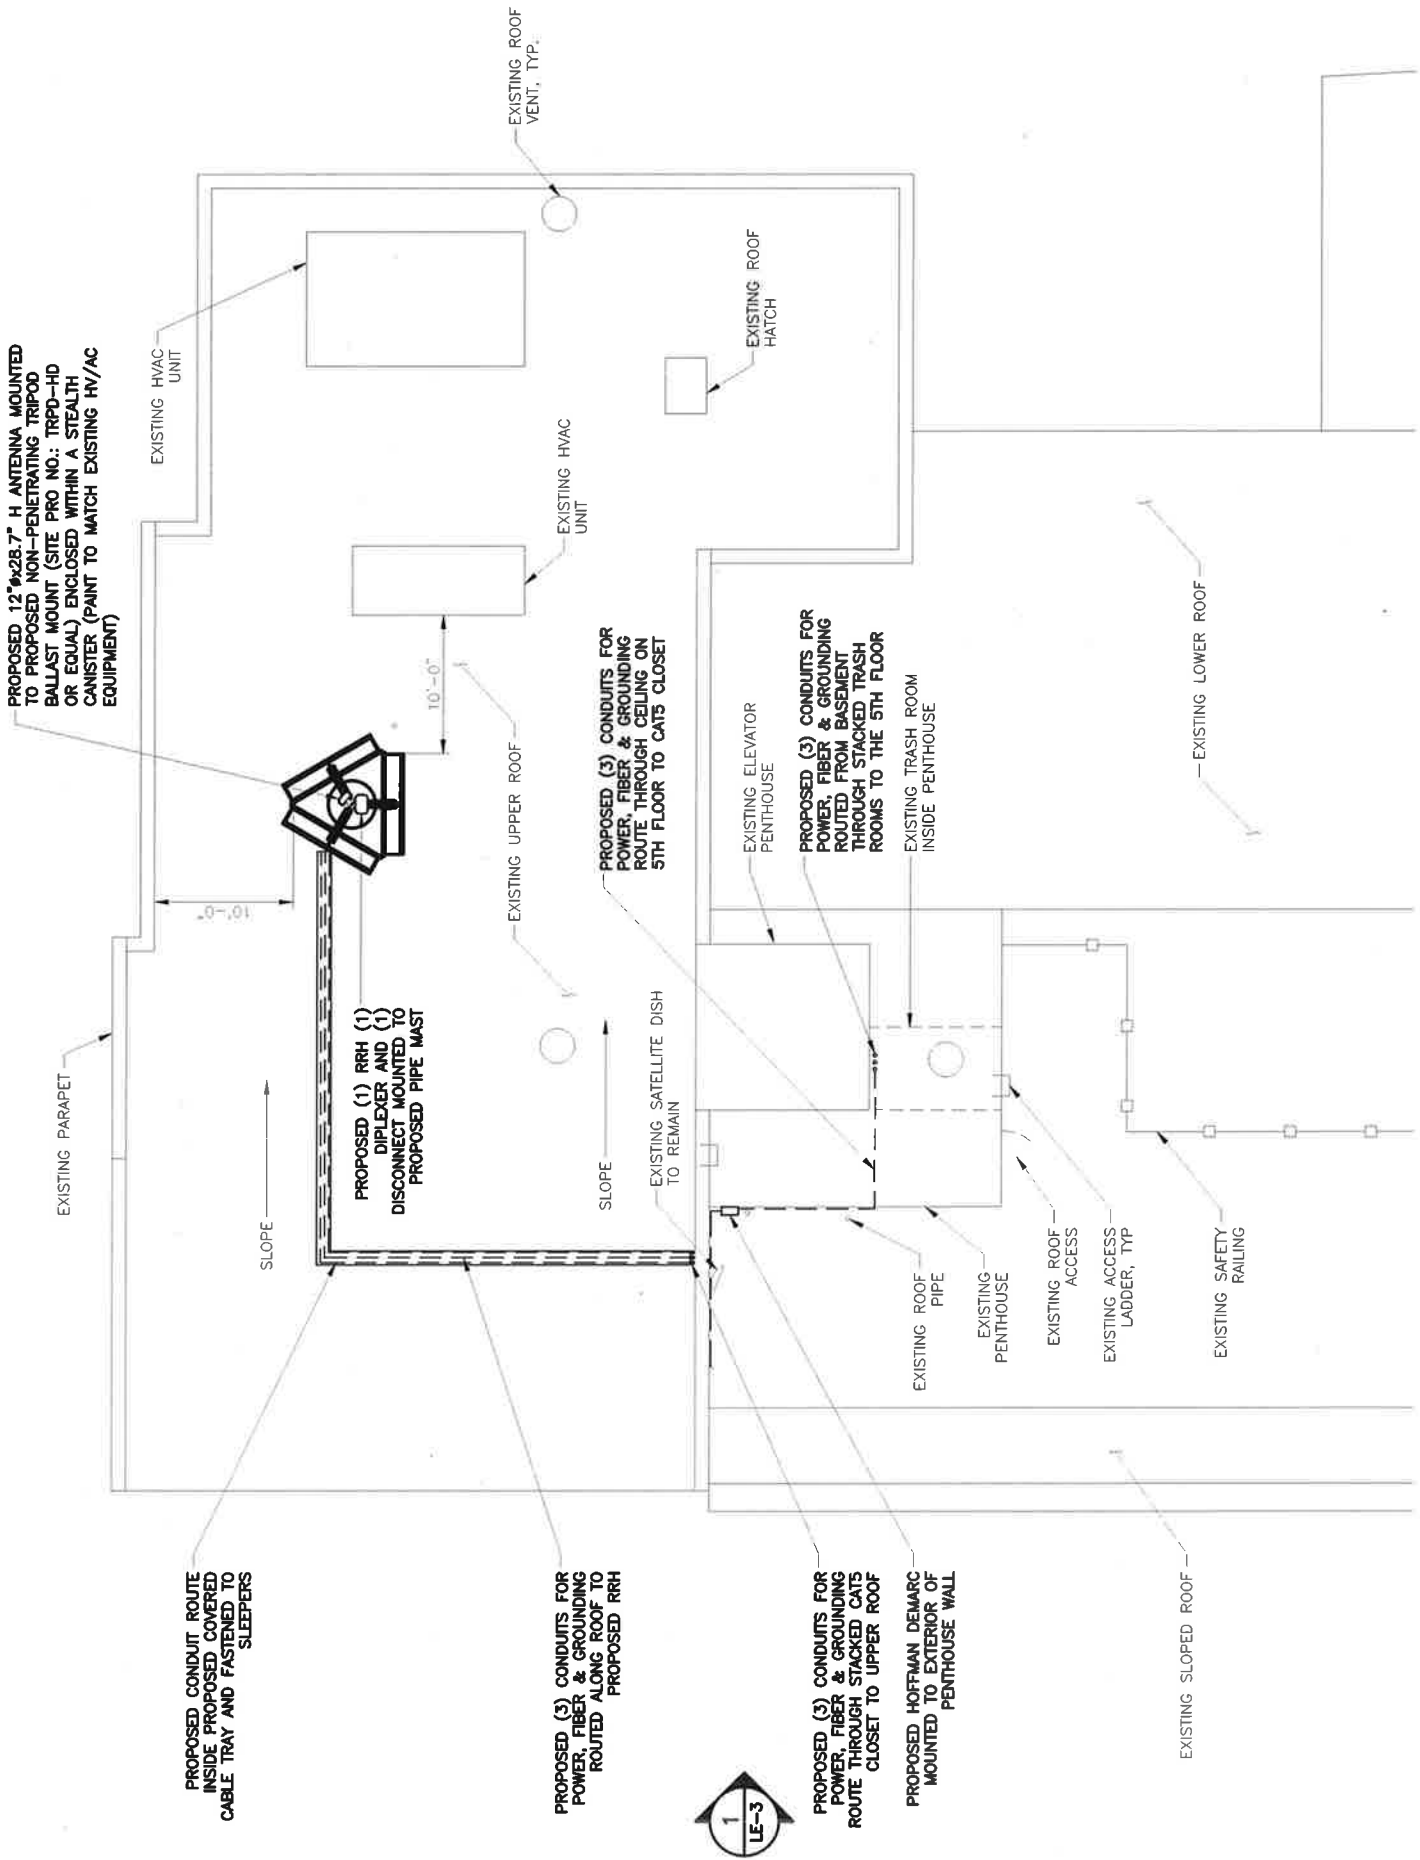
PROPOSED EQUIPMENT LOCATION PLAN
